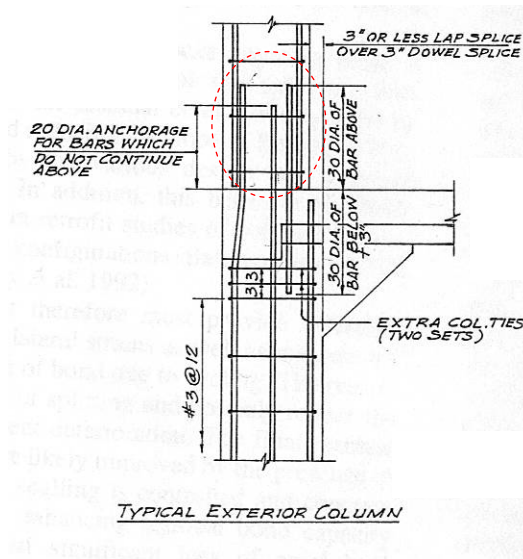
Poorly detailed lap splices of longitudinal reinforcement
